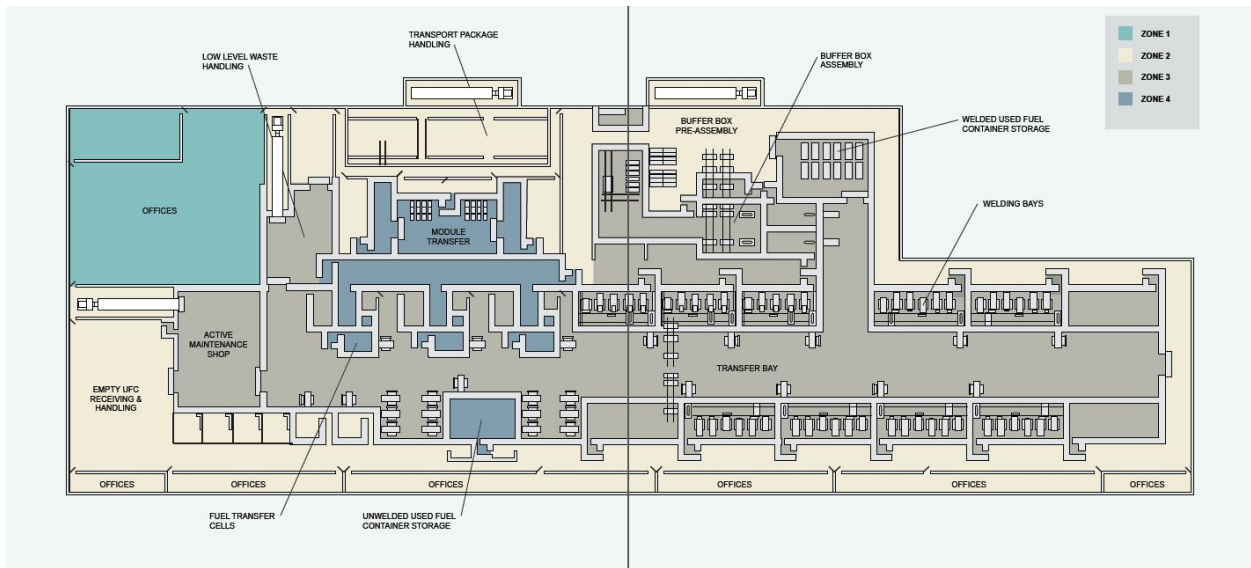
Example of a layout for a Used Fuel Packaging Plant
